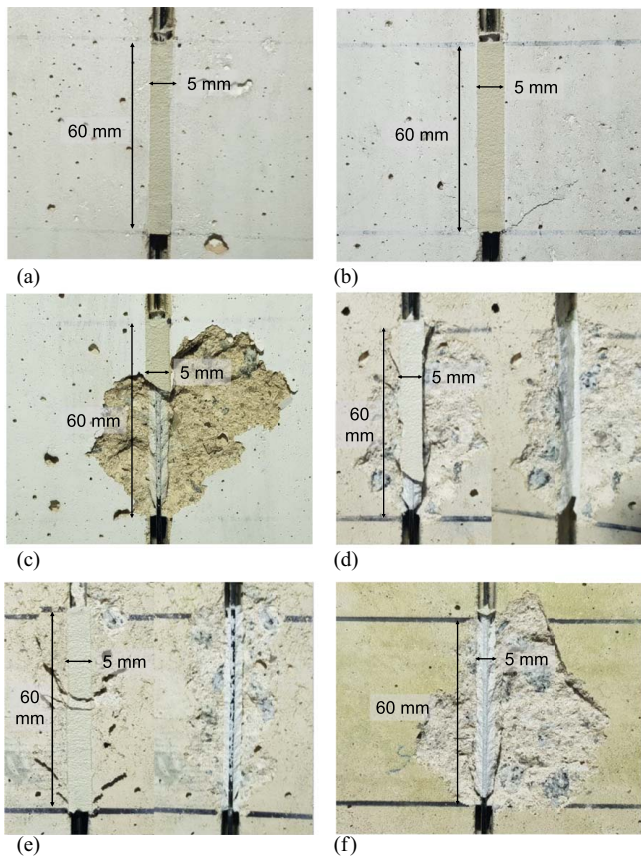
Failure modes observed in pull-out tests of bond NSM-CFRP to concrete specimens: (a) debonding failure at CFRP laminate-adhesive interface (F/A); (b) debonding failure at CFRP laminate-adhesive interface with concrete cracking (F/A + CC); (c) debonding failure at CFRP laminate-adhesive interface with concrete splitting (F/A + CS); (d) cohesive failure in the adhesive with concrete splitting (A + CS); (e) debonding failure at adhesive-concrete interface with concrete splitting (A/C + CS); and (f) cohesive failure in the concrete with concrete splitting (C + CS).
